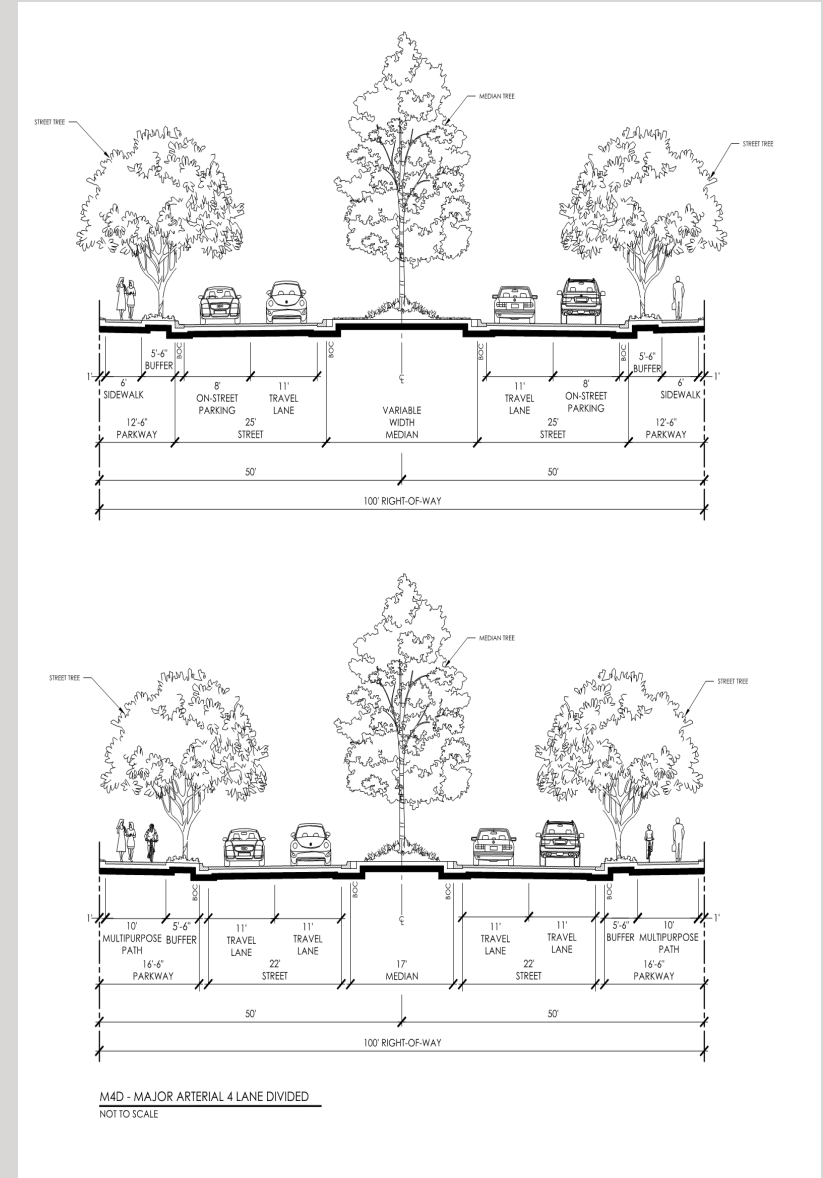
M4D Typical Cross-sections Major Arterial 4-lane Divided Cross-Sections
